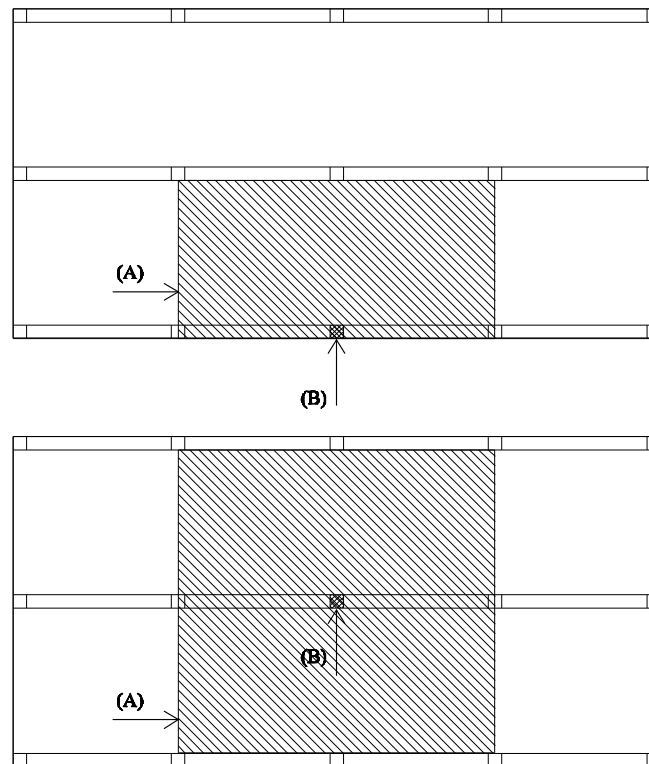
Acceptable limit of local failure in multi-storey buildings
